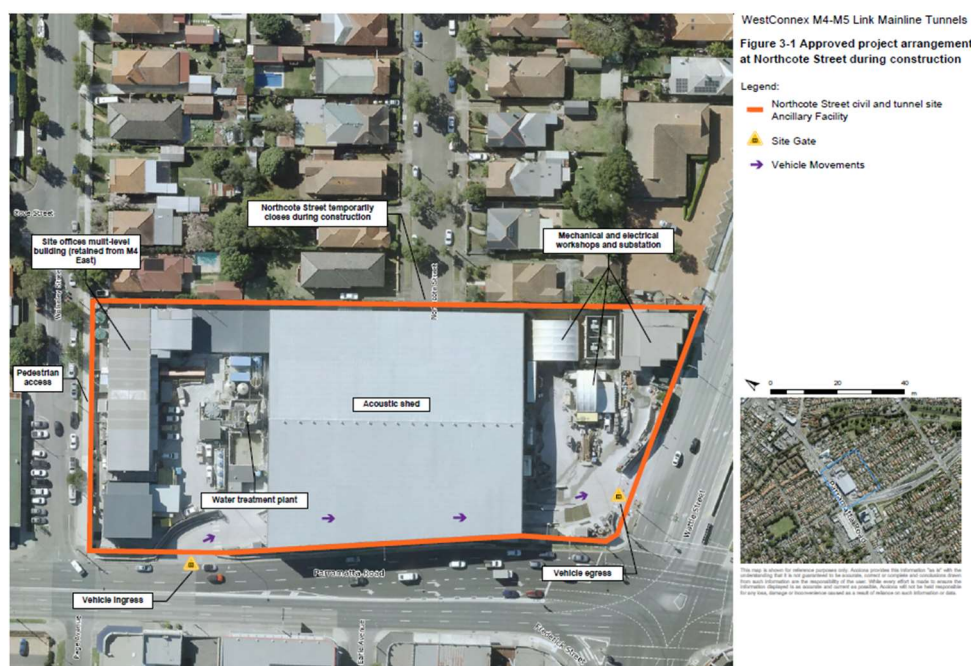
| Approved project arrangement at Northcote Street during construction (Source: Modification Report April 2022)
